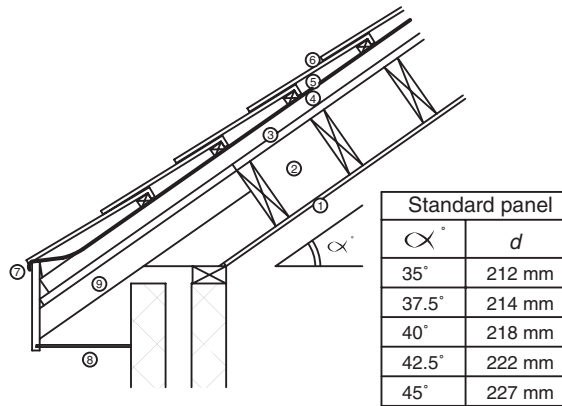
Cassette roof – standard panel to party wall spandrel fixing.
